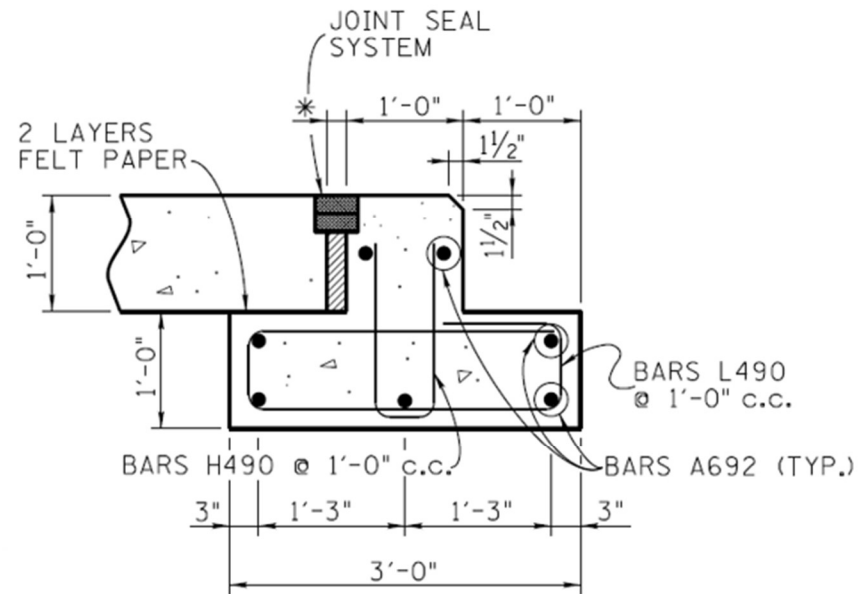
Detail of the sleeper slab as specified by New York DOT (Sheet BD-SA2E of Bridge Detail Sheets).
